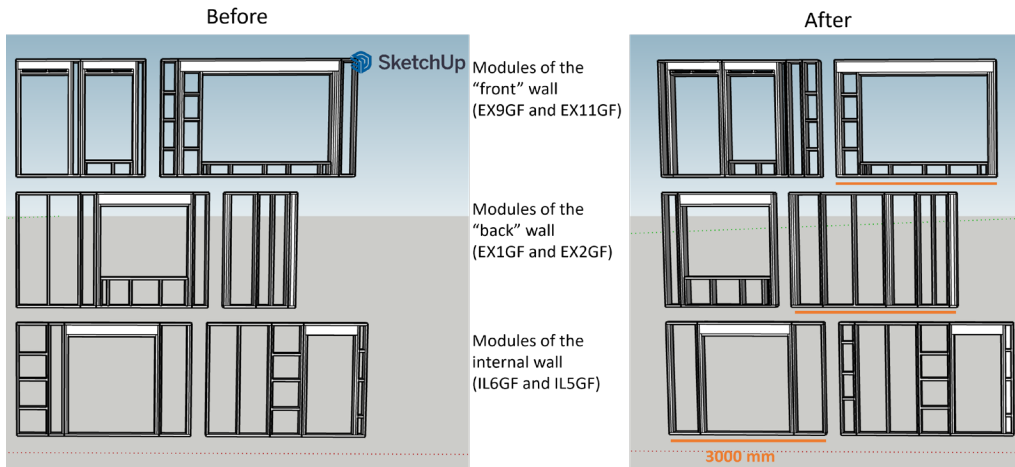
Changes in wall panels. Front, back and internal wall change in length and position of openings.
